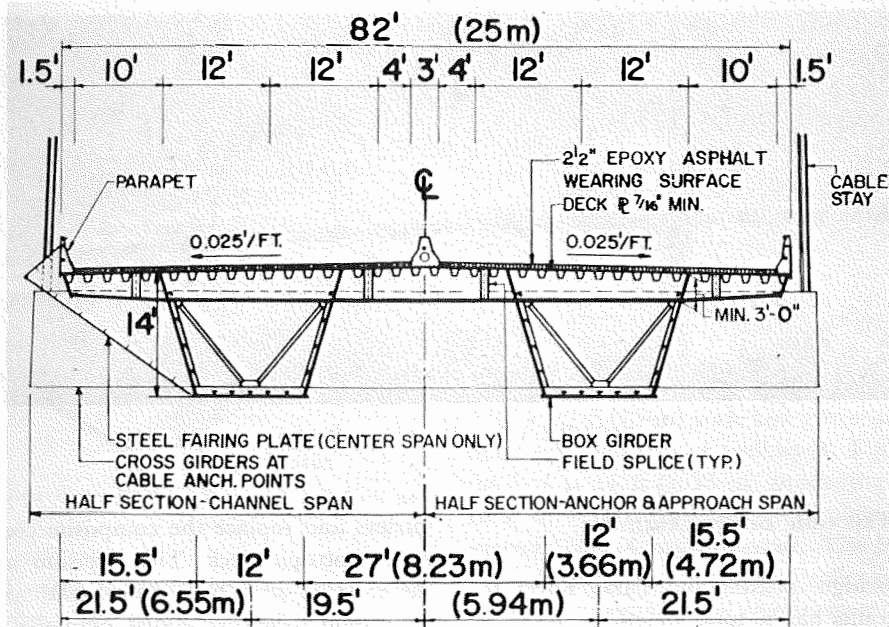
Luling Bridge, typical cross section, from reference 33.
